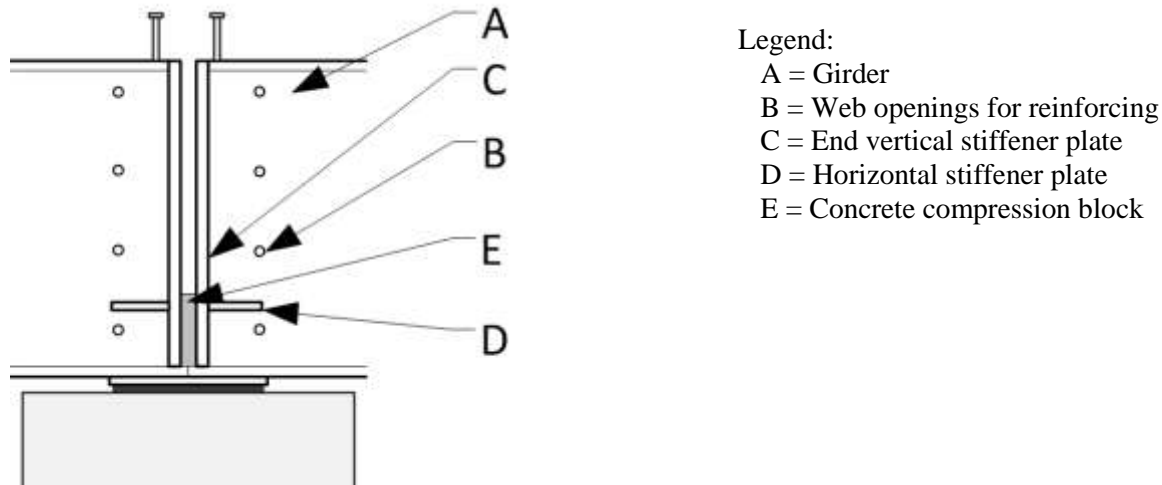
Girder connection specimen modeled at University of Nebraska – Lincoln (Lampe N.J., 2001)
